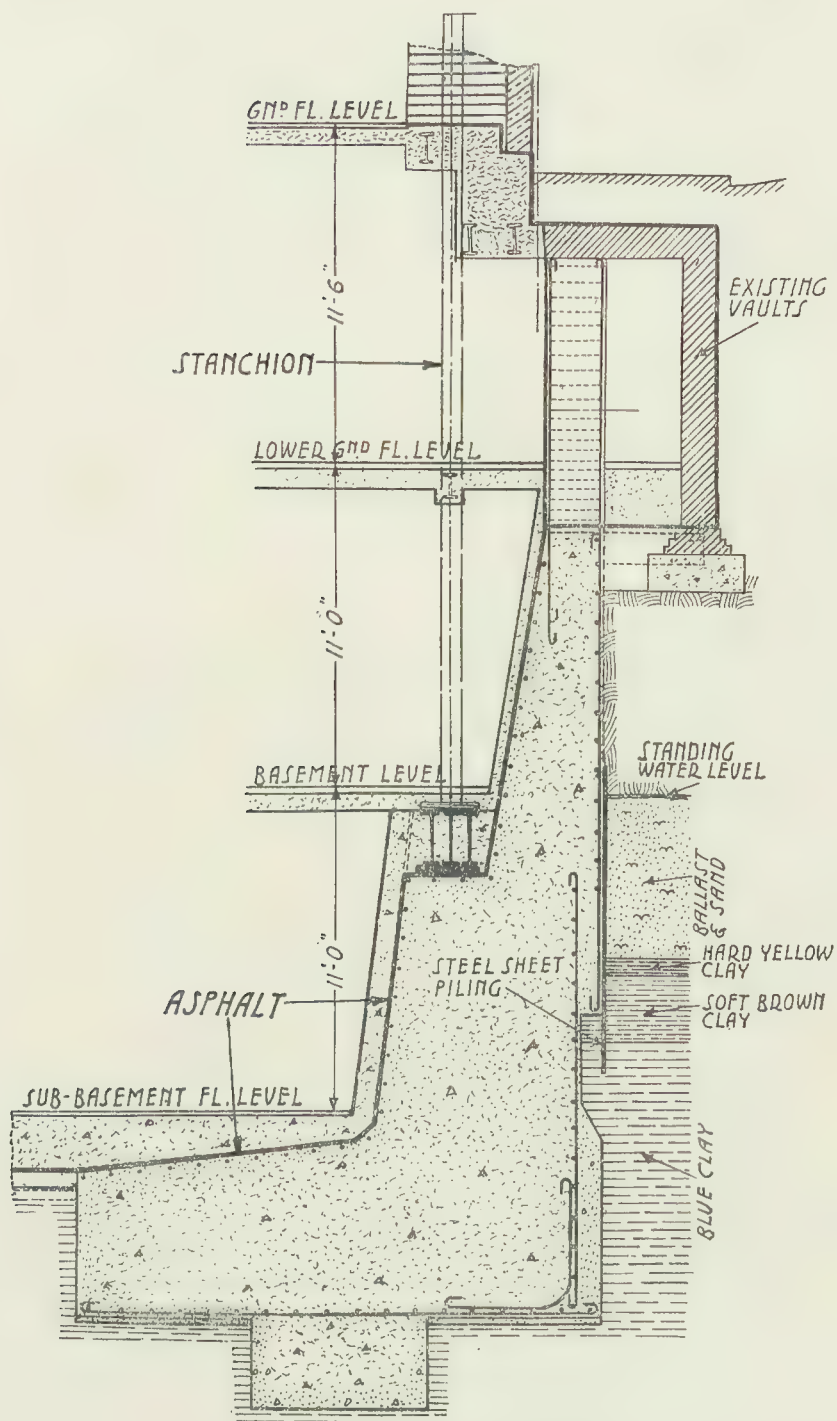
REINFORCED CONCRETE RETAINING WALL FOR MULTIPLE BASEMENT FLOORS
